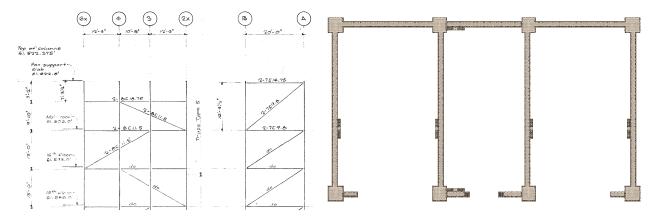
Typical mechanical tower bracing configurations. The top floors of the HSE tower are shown. The HSW tower is similar.
